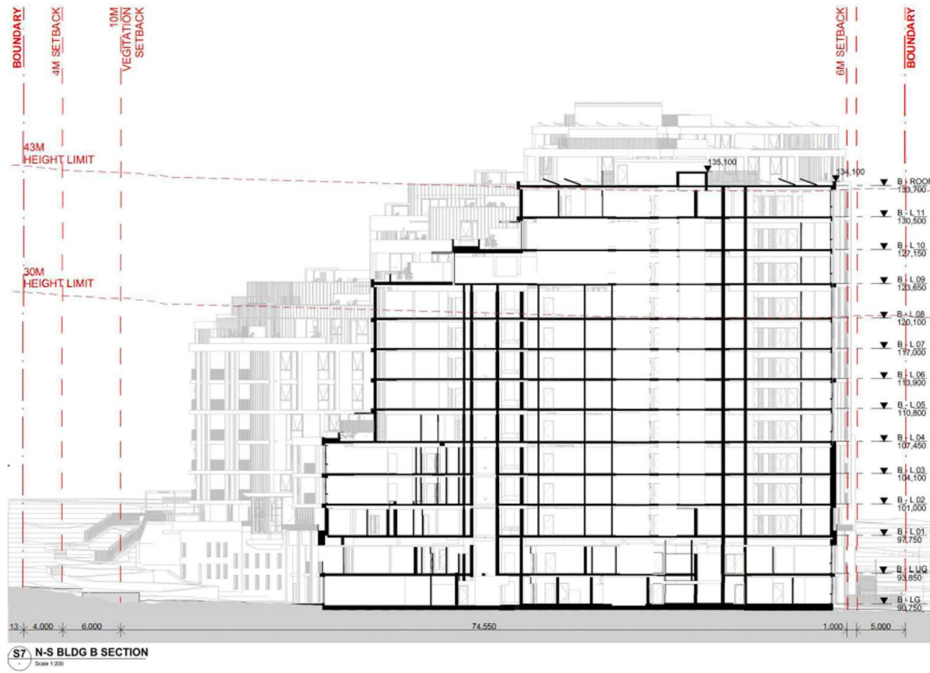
Approved and Proposed N-S Section of Building B (2 of 2)
